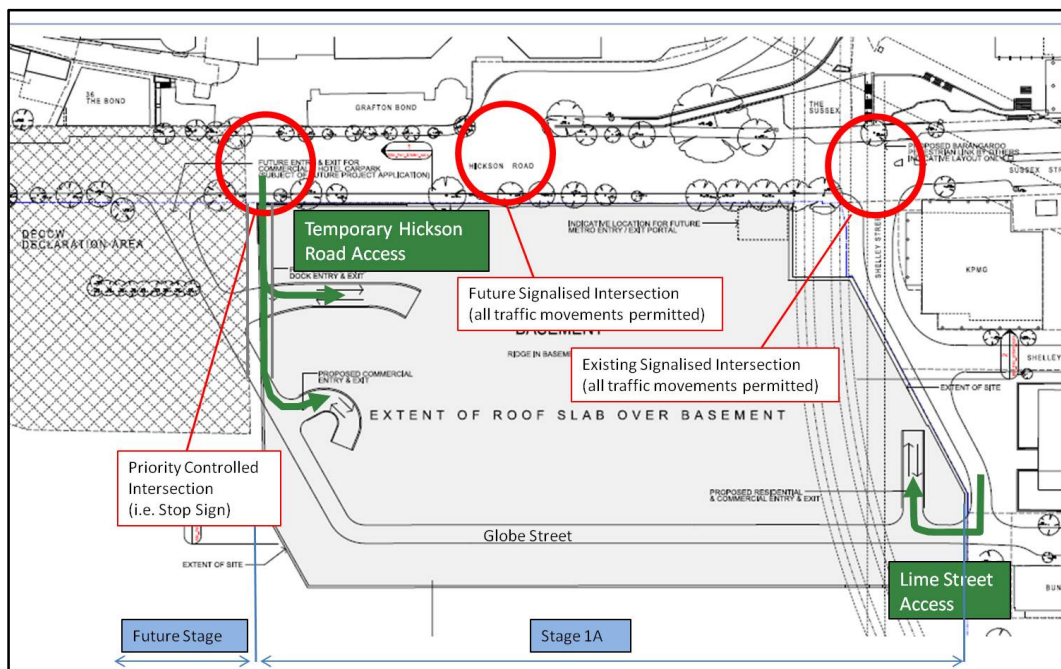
Vehicular access to the basement servicing the C3 Commercial Building
